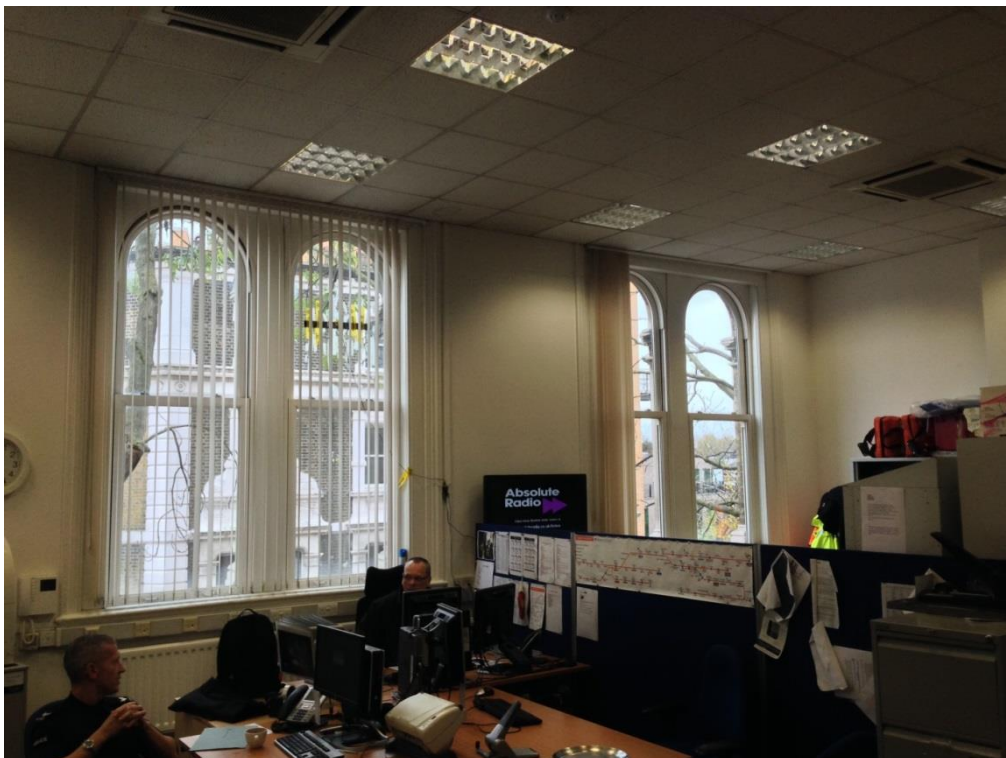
Showing the typical fit out of the First Floor offices (Room 6).
